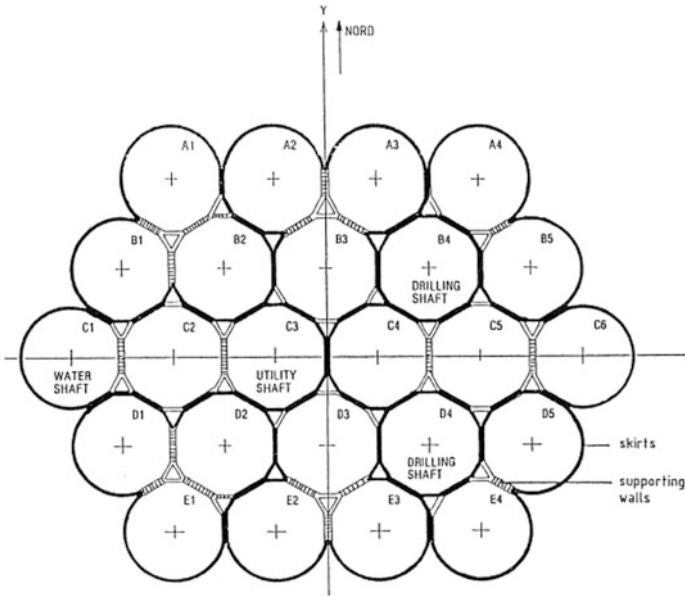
Foundation plan of the GBS (courtesy of Aker Solutions)
